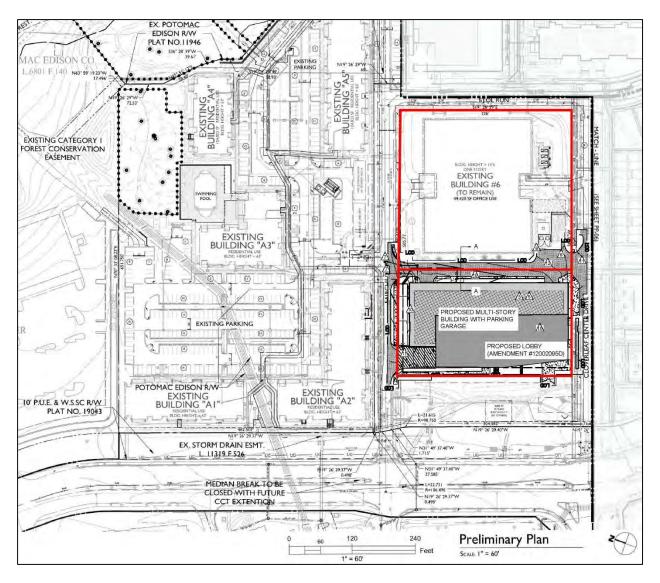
Preliminary Plan Layout (Subject Property Outlined in Red)
